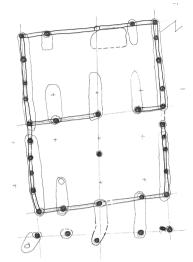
S-9 FOUNDATION DIGGING PLAN
